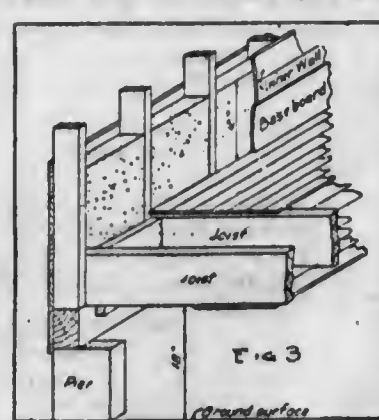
Buildings Supported on Piers Are Ratproofed by Raising Above Ground Level and Placing Concrete Between Walls Above Sills.
